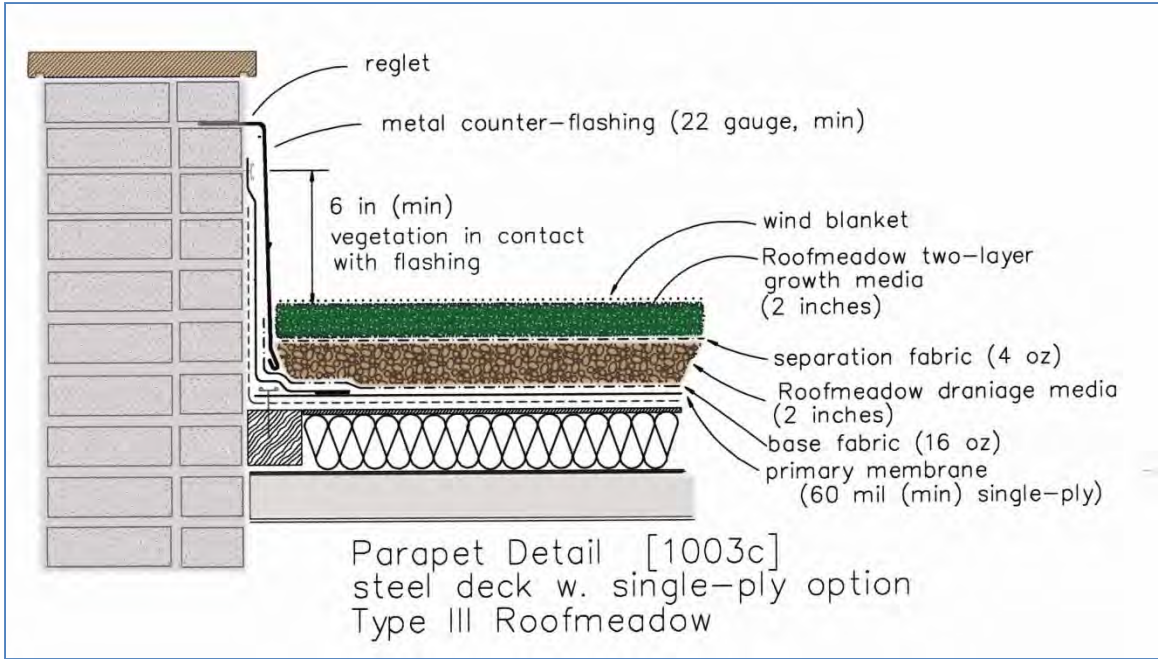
Example parapet flashing detail (courtesy Roofscapes, Inc.)
